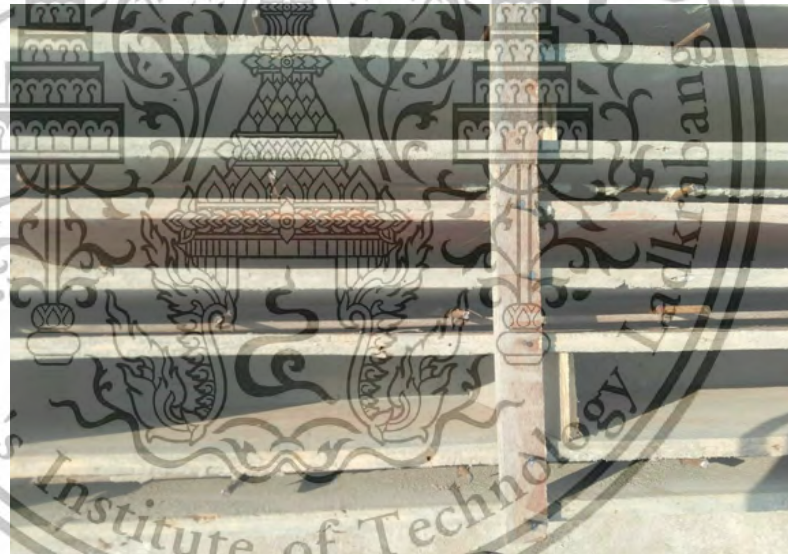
Steel case in wooden formwork for U-shape permanent formwork.
